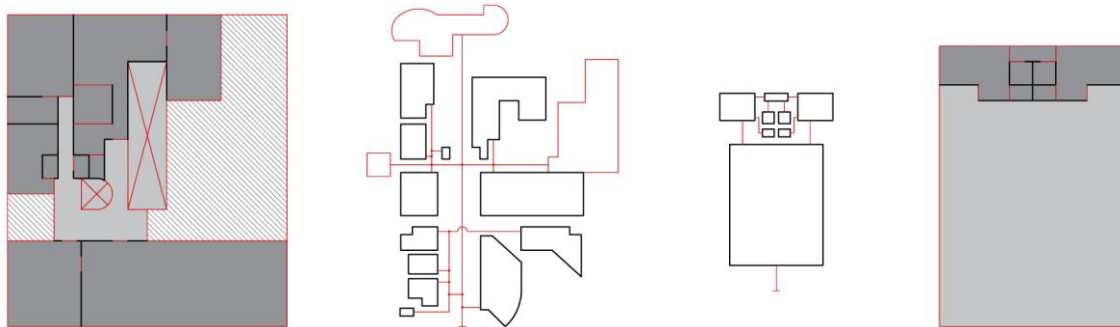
Floor plan (1/500), structure of spaces (1/1000). *Villa Savoye* and *IIT Chapel* (Source: author).
